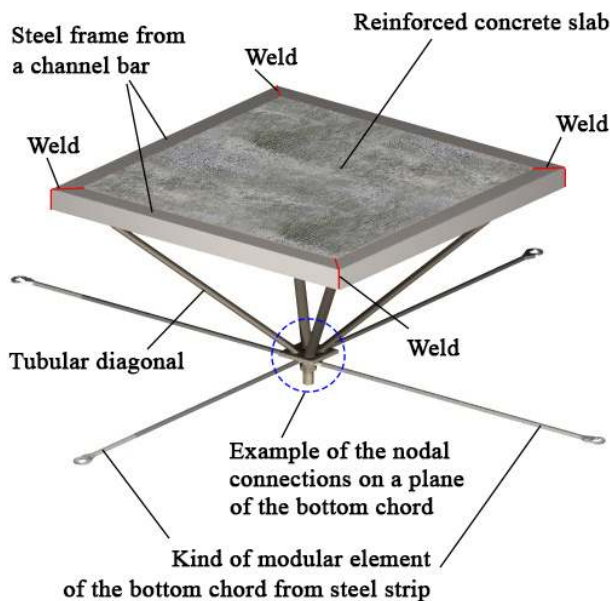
Improved designs of the steel and concrete composite space module with a steel frame
